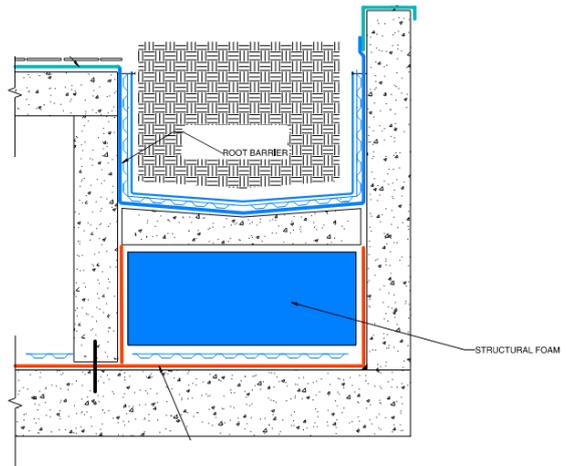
De-Identified Planter Waterproofing Section Illustrating the Liner Turn-Up With Root Barrier and Drainage/Protection Layers, Highlighting the Termination Zone Where Continuity and Secure Edge Restraint Control Leakage Risk
